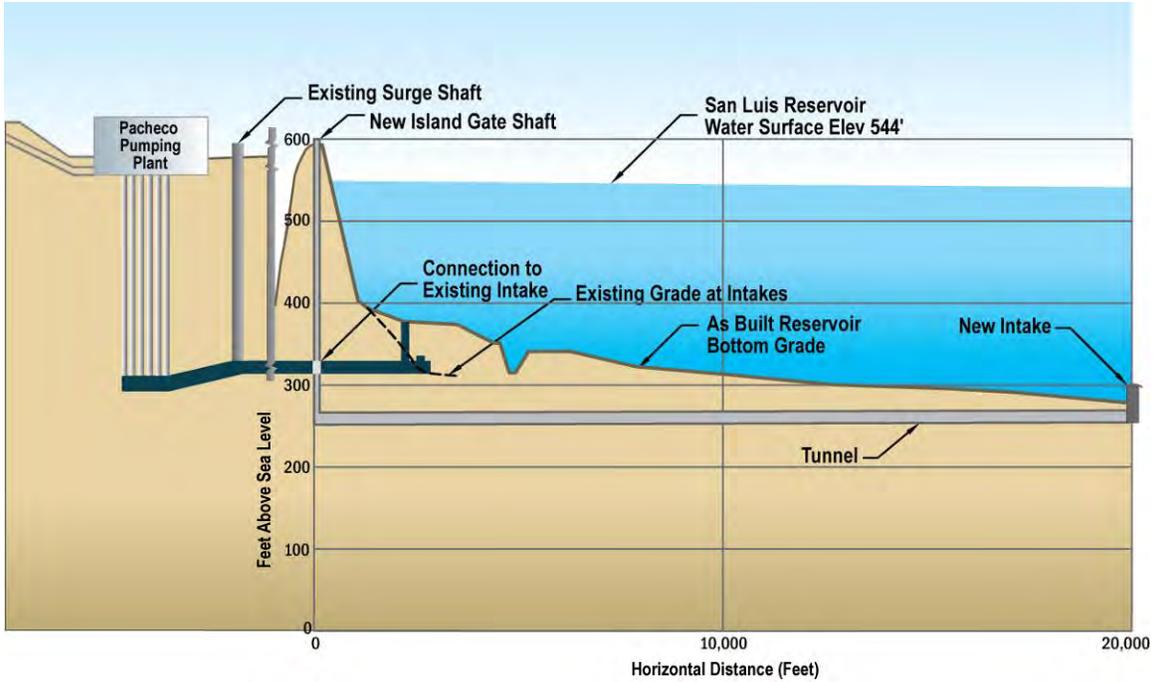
Lower San Felipe Intake Alternative Plan Tunnel Profile
